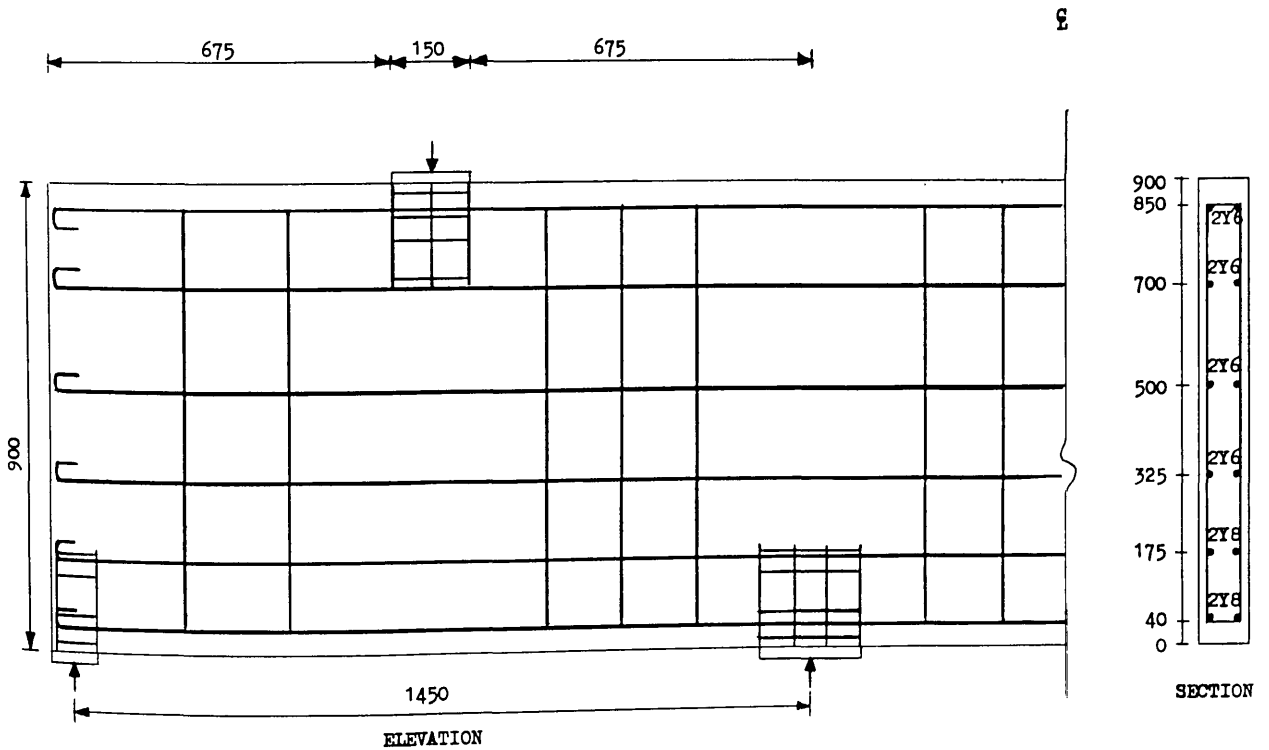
Dimensions and reinforcing details of girder TRGRAS1
